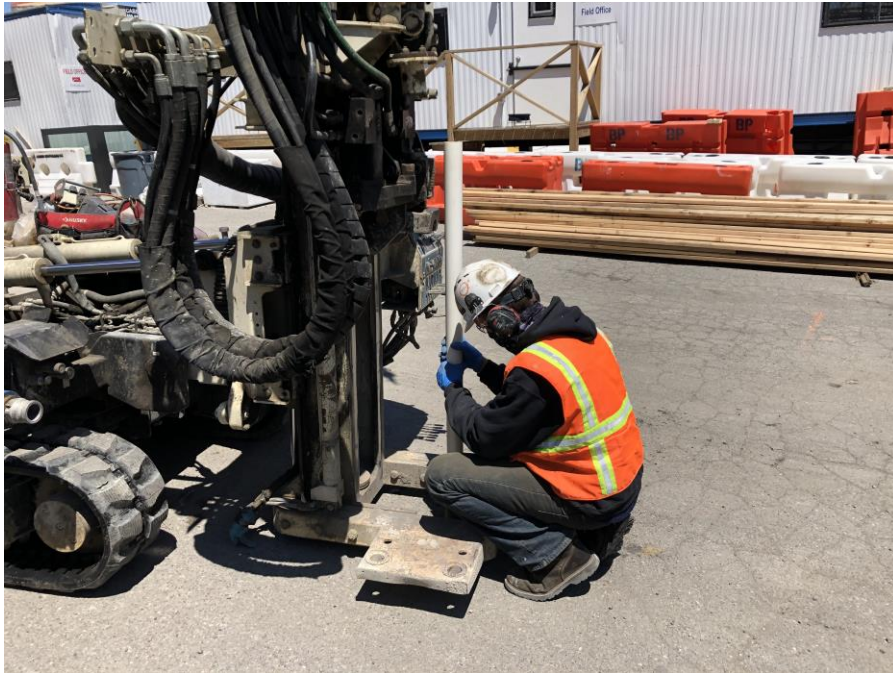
, 5/13/2020: View of Eastern installing monitoring well MW19, facing east.
